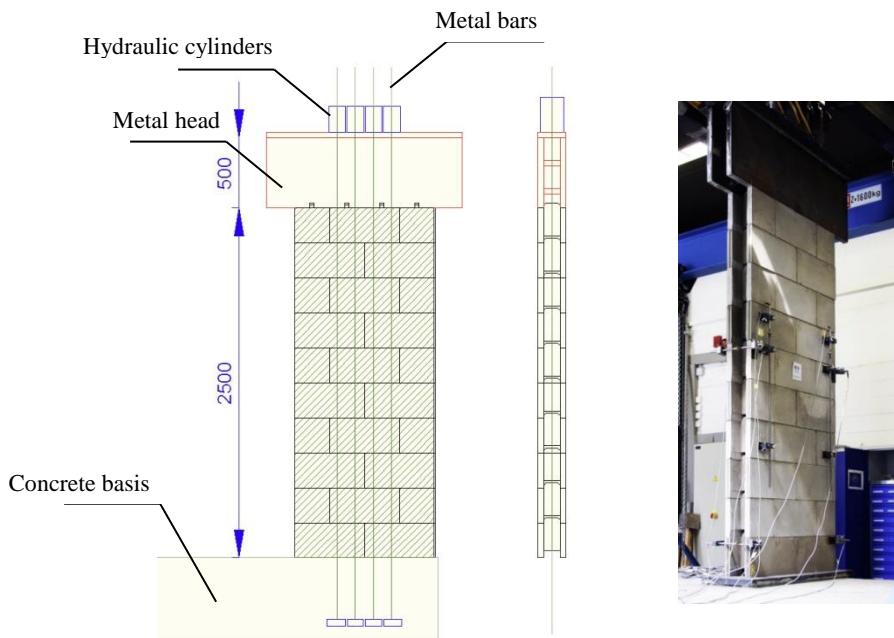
Loading of a wall of 2.50 m height, made of modular concrete blocks.
